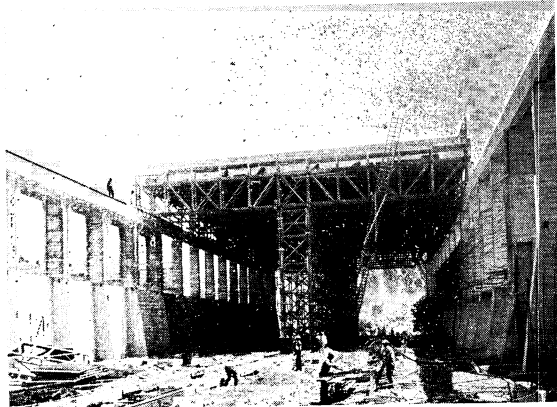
Steel form travelers, 43 ft wide, for Richmond, Va., marine terminal warehouses; 6-in. H-columns at 12-ft centers support steel trusses 6 ft apart. Chords and knee bracing consist of 4 x 3-in. angles; web members and wind bracing are 3 x 3-in. angles. The plywood roof deck is supported on staggered 4 x 6 in. timbers at 2-ft centers. Cast steel wheels of 14-in. diameter are attached to each post between two 8-in. channel stringers. A pair of jacks are built into these stringers at each wheel
